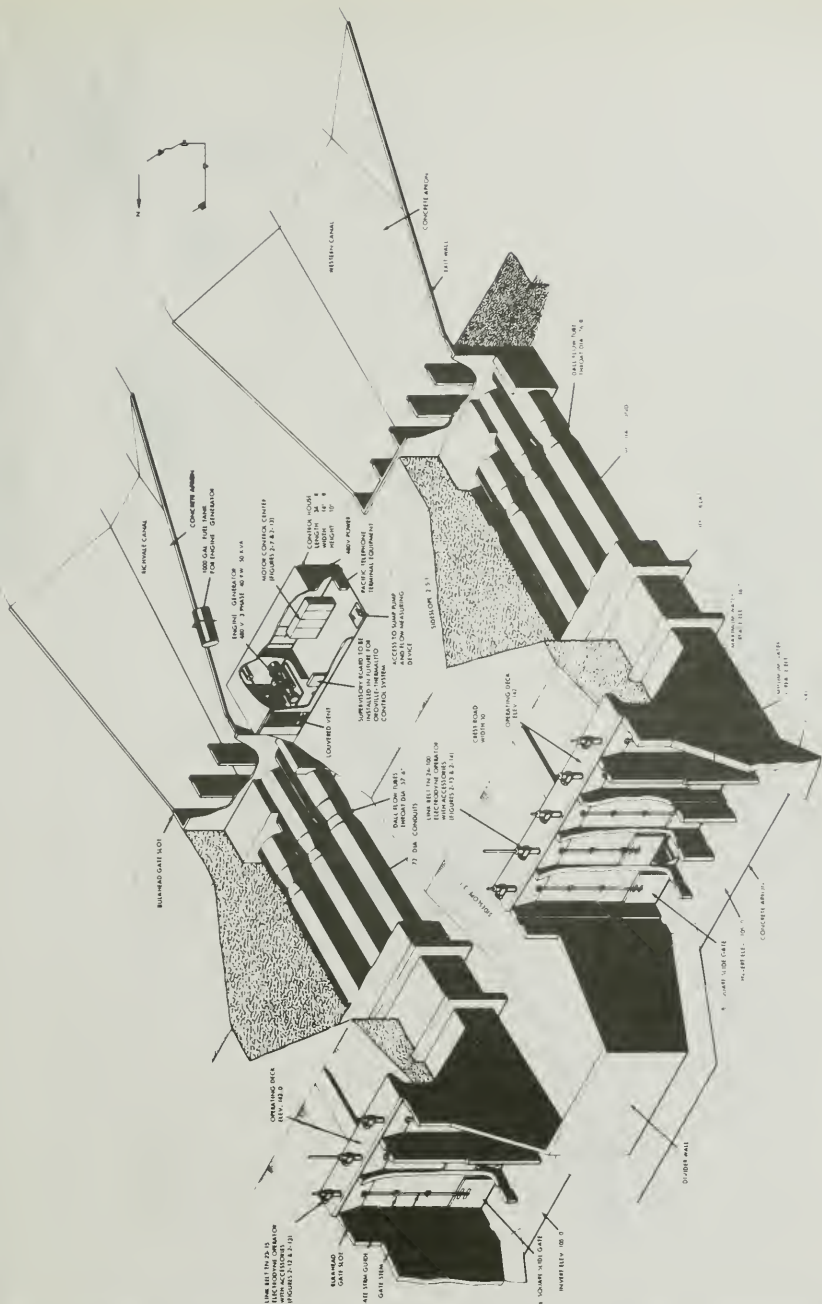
Western Canal and Richvale Canal Outlets—Isometric View
